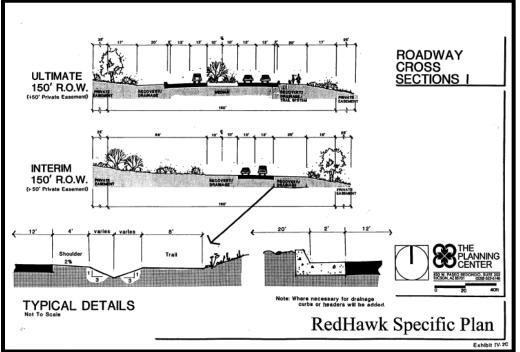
Original Dove Mountain Boulevard Street Typical Sections.
